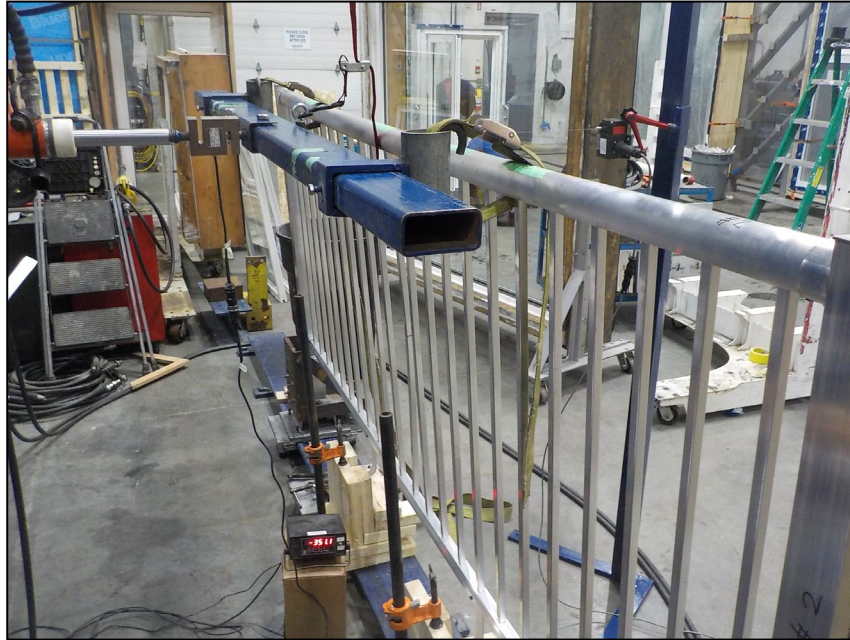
Century Welded Fascia: Horizontal Uniform Load Test
